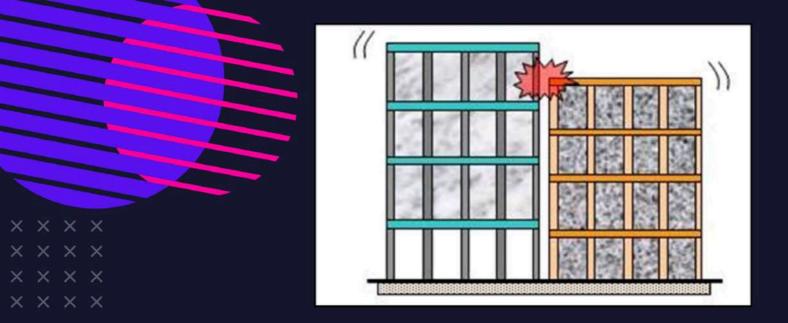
Pounding can occur between adjoining buildings due to horizontal vibrations of the two buildings
